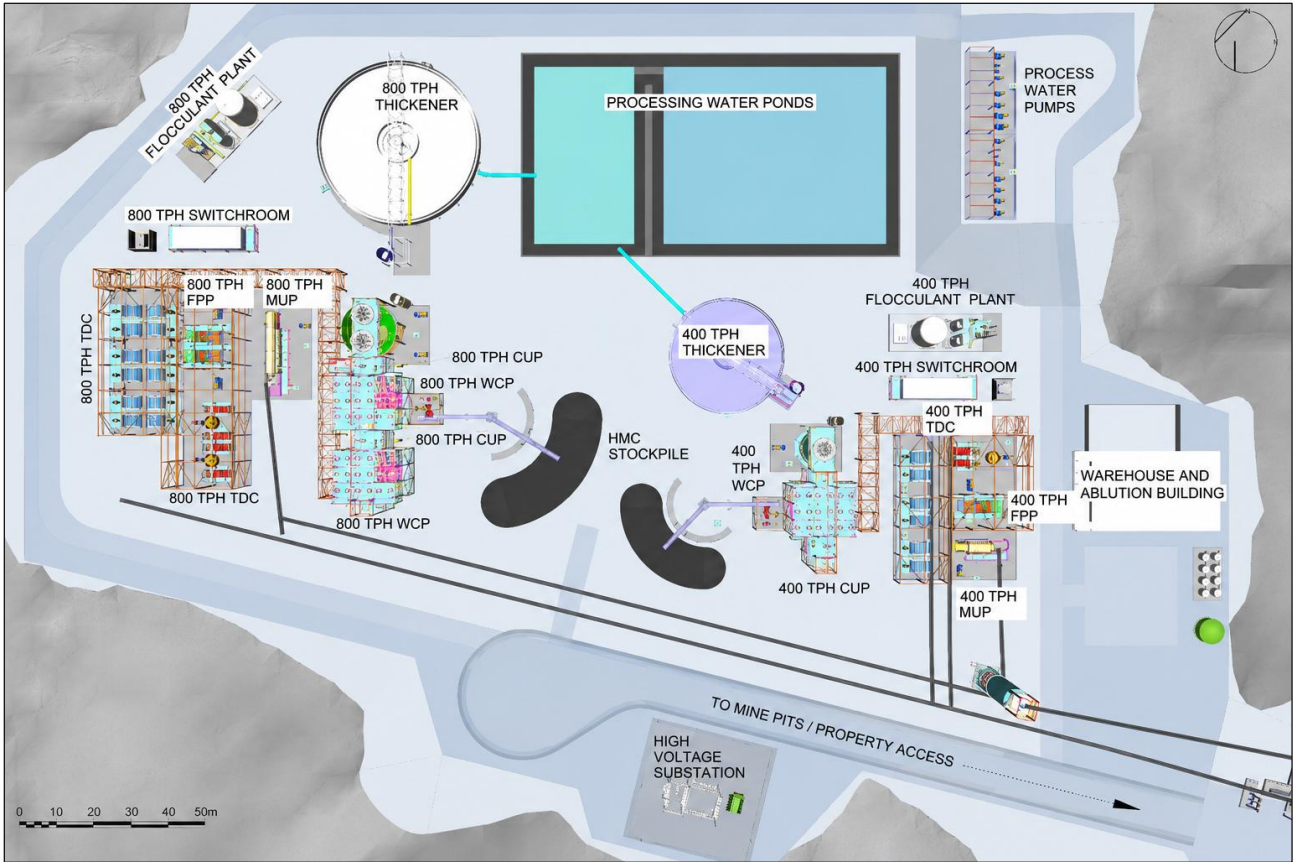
Titan Project wet Concentrator plant site layout / 3D model.
